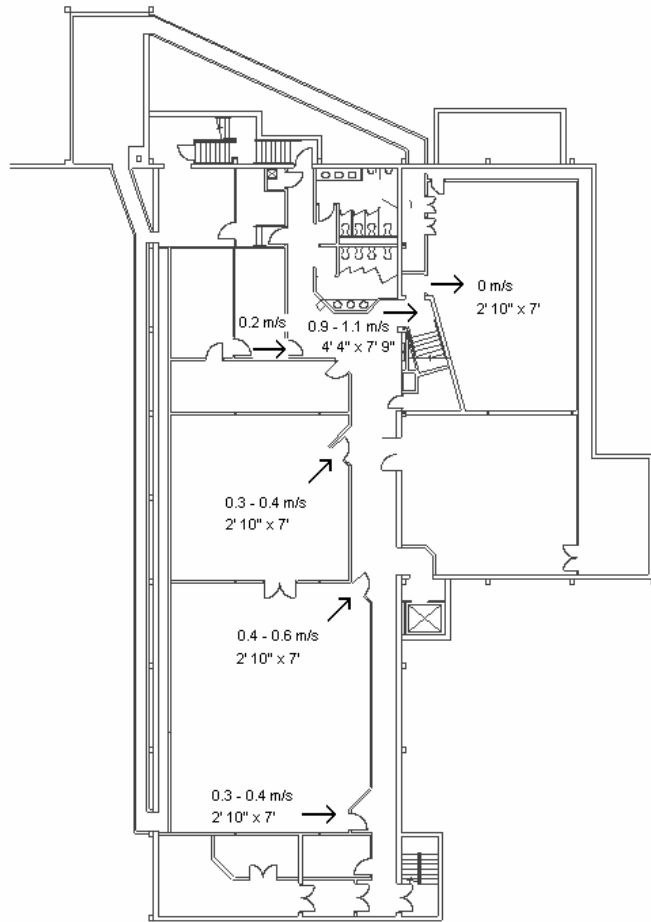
Coronado Club Basement Level Air Flow Measurements. Dimensions refer to door or passageway opening size.
